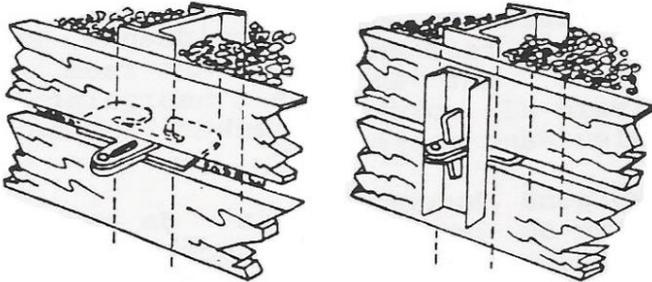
U-shaped iron and hook (Wylaers M., 2016, *Bouwtechniek 1 – Berlin walls*)
